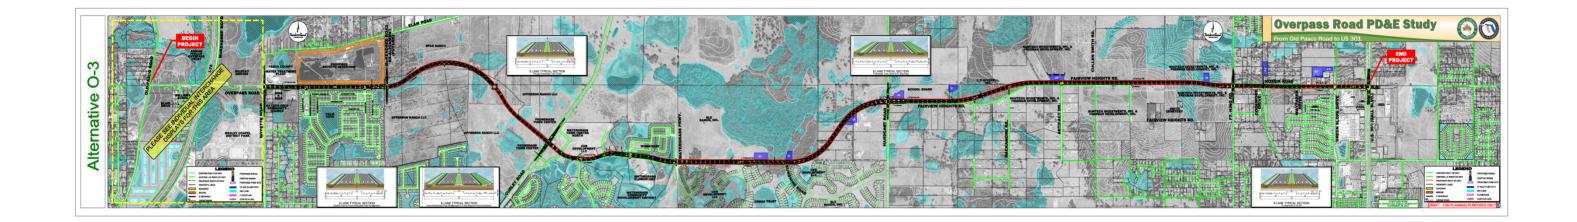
RECOMMENDED BUILD ROADWAY ALTERNATIVE
